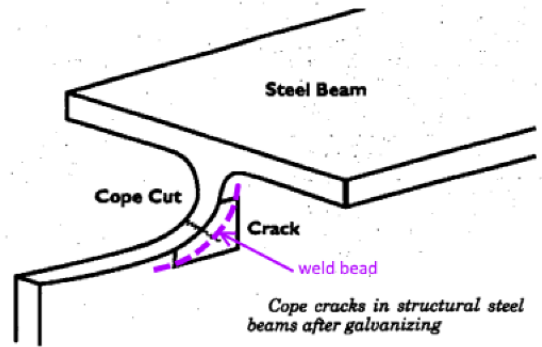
Coped Beam End with Corner Radius and Weld Bead
